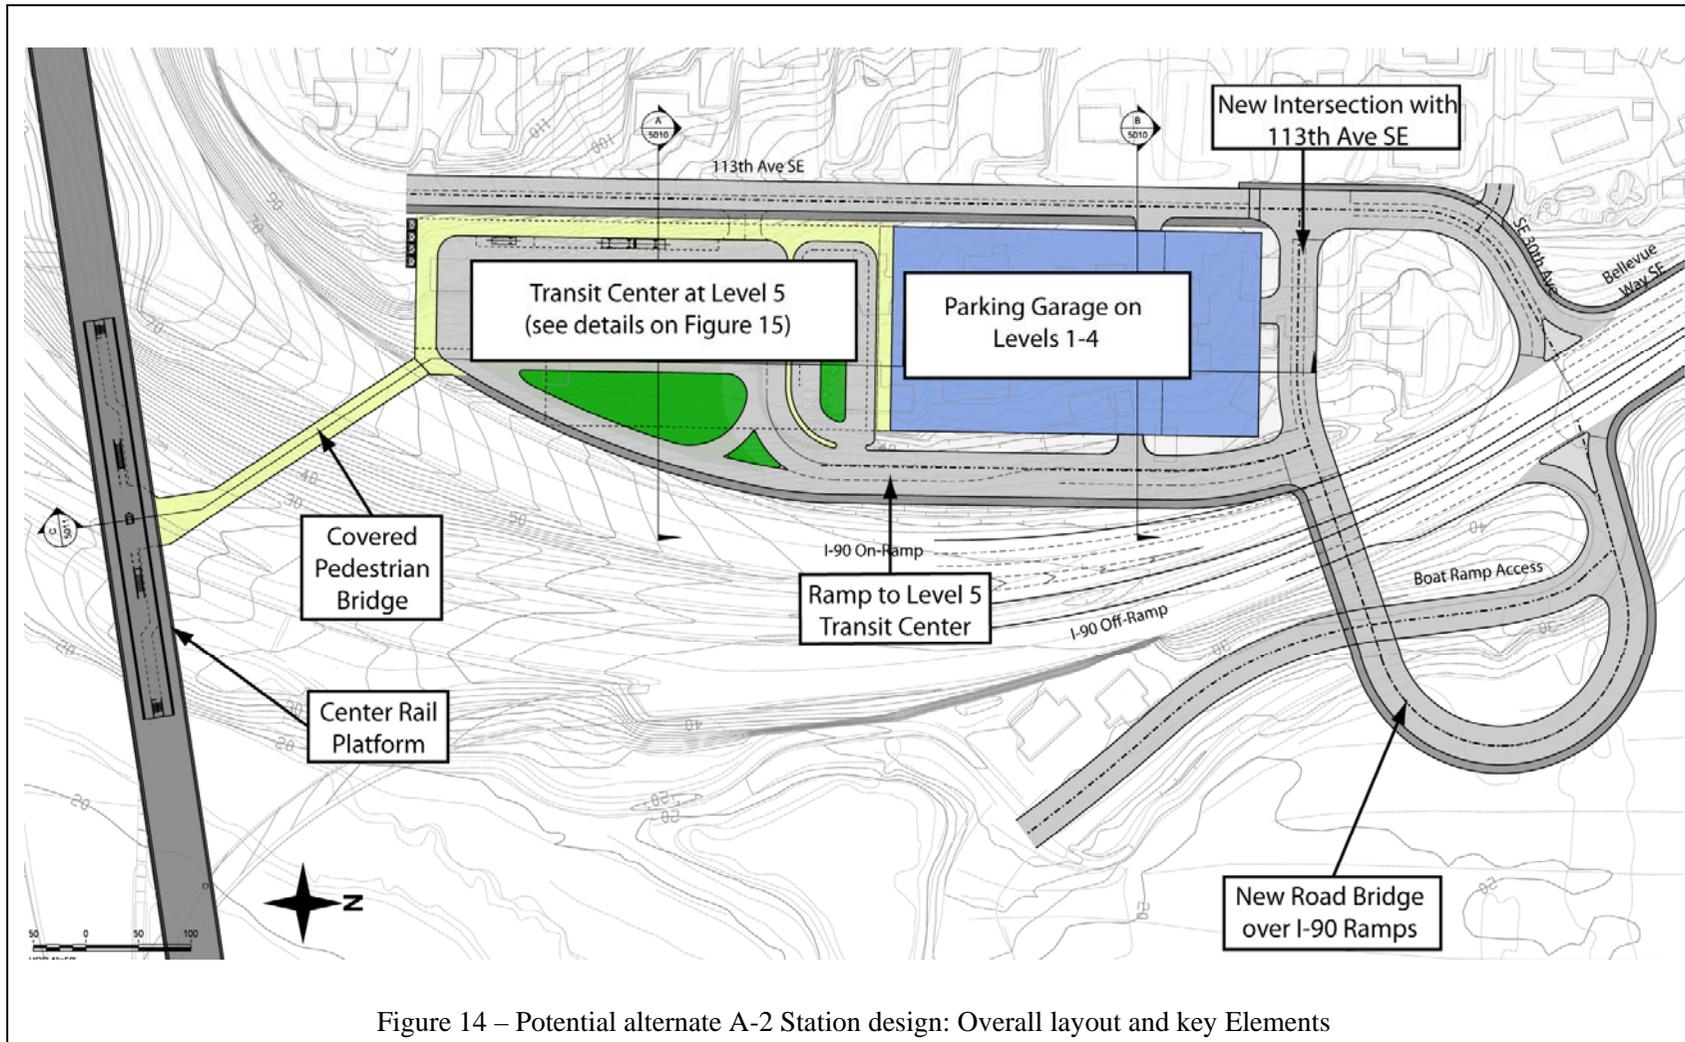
Potential alternate A-2 Station design: Overall layout and key Elements
